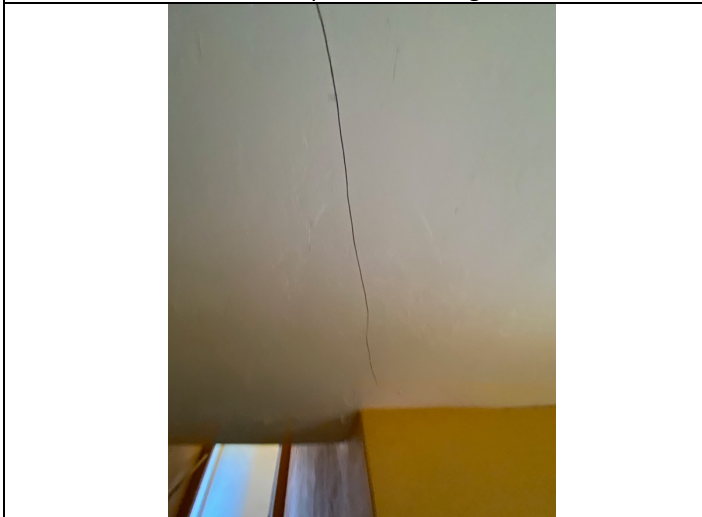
2nd floor ceiling plaster cracking due to settlement
